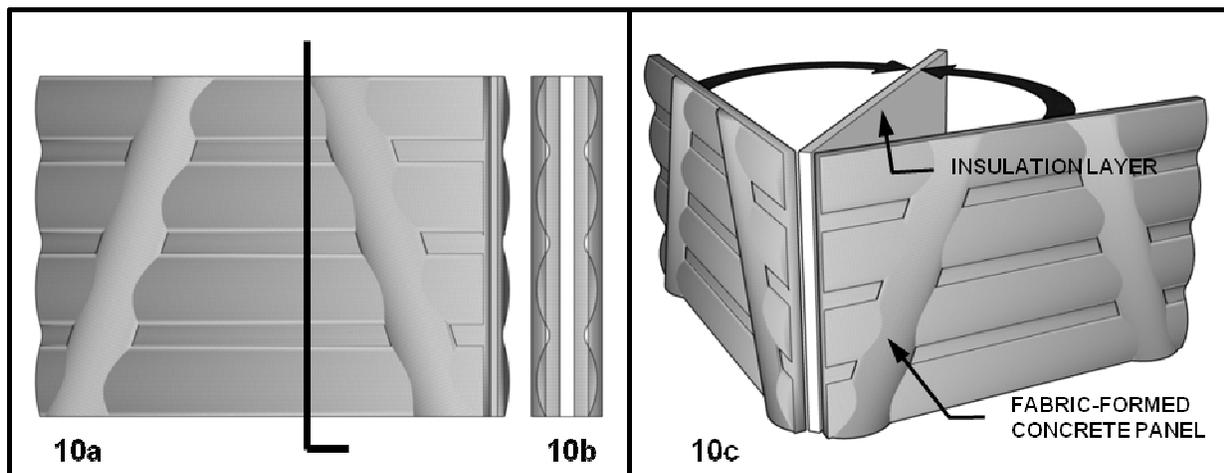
Computer aided design drawing of a fabric-cast wall panel system (Figures by RPS).
